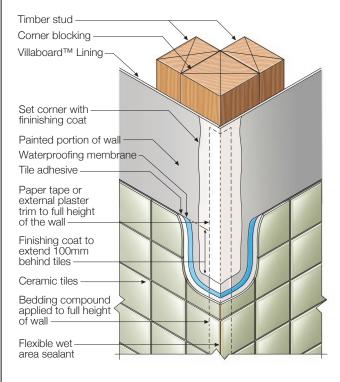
INTERNAL TILED CORNER OPTION 2 - BLOCKED CORNER FIGURE 8 EXTERNAL TILED CORNER - BLOCKED CORNER HALF TILED WALLS HALF TILED WALLS
